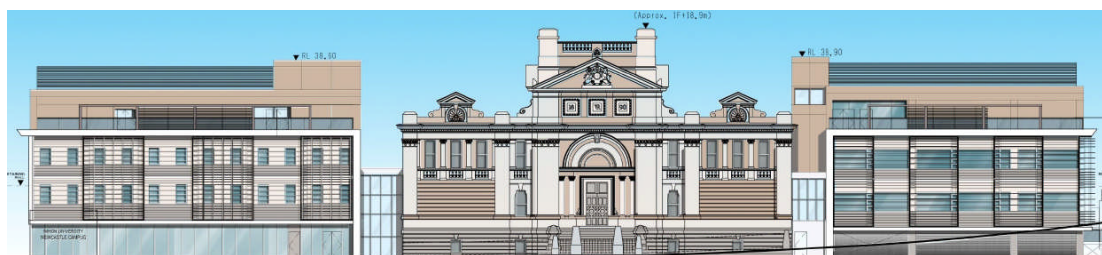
The Church Street elevation of the Courthouse with new residential and education buildings.
